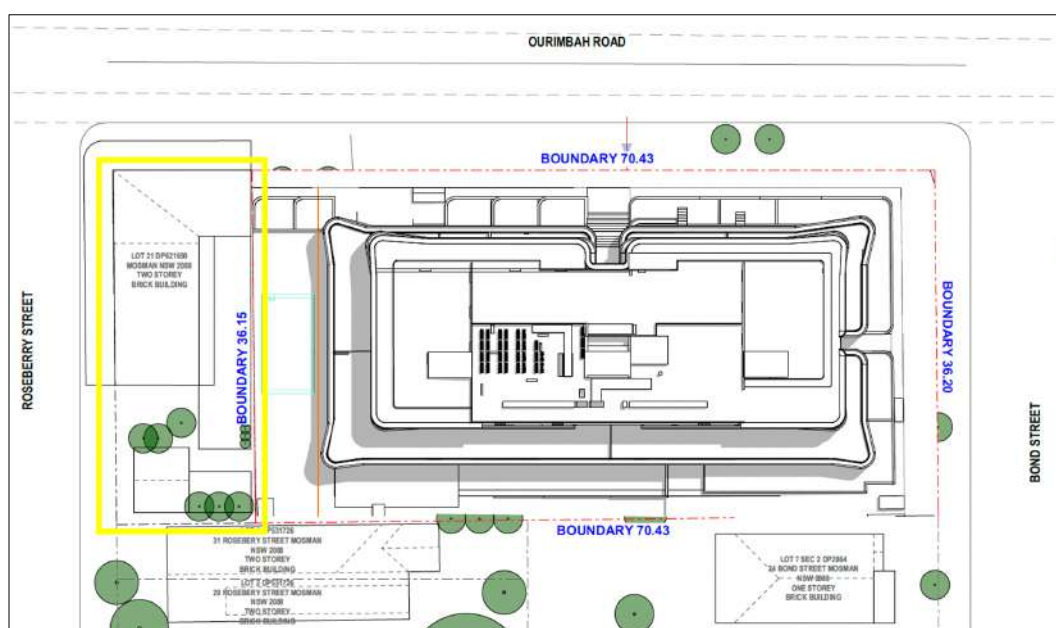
The roof plan of the proposed works. The adjacent heritage item is outlined in yellow, illustrating the setback between the proposed mid-rise development and the item.
